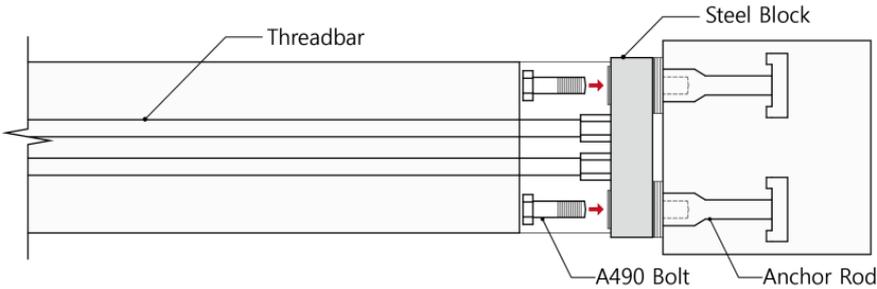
Pure dry cast method; Beam-to-column connection using pre-tension bolts
